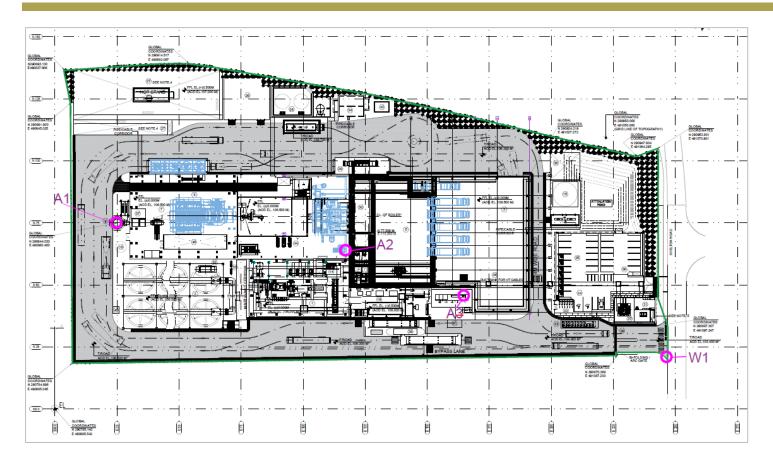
Facility plan – adopted from plan (ref: RPS drawing – Site layout JER9793)
